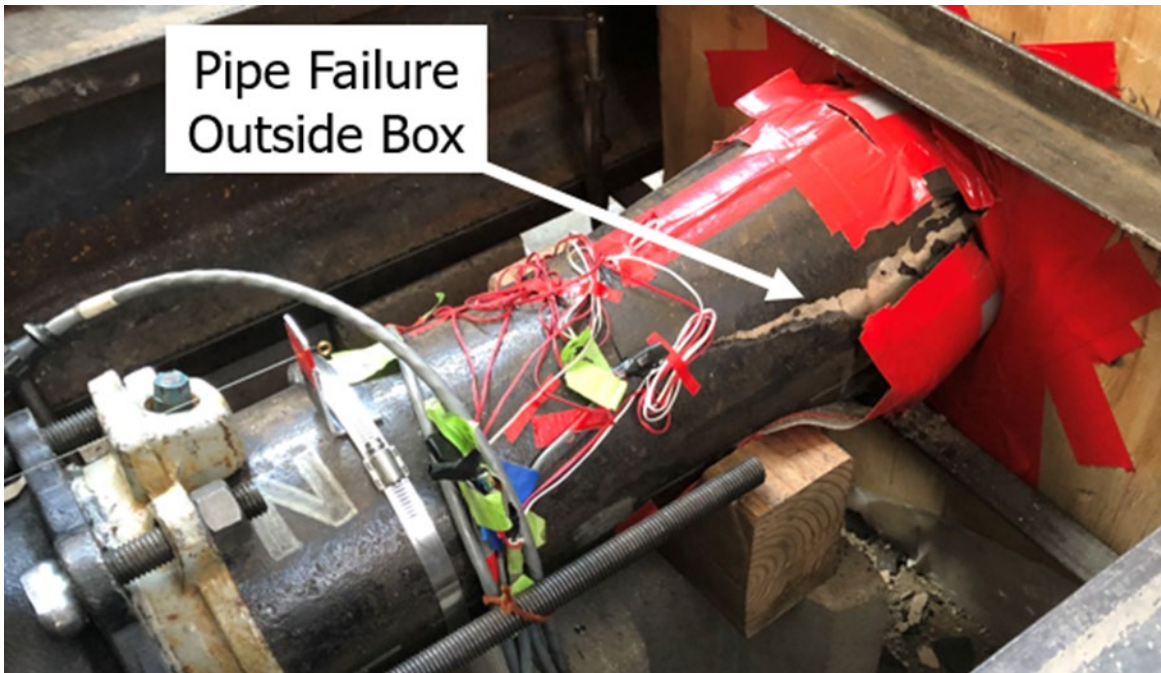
DC 3 Fractured Test Pipe Specimen
